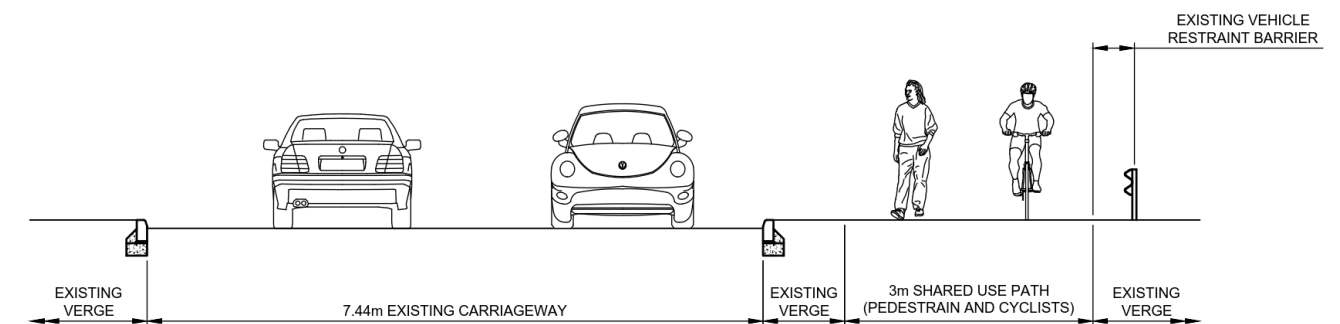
Cross Section Route 9 – At Bridge over Railway Line
